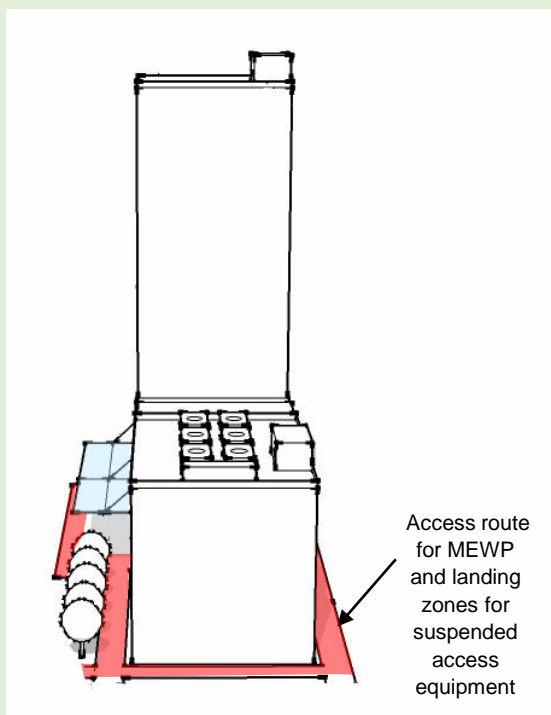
Access route and landing zones should be planned and designed for around the building
